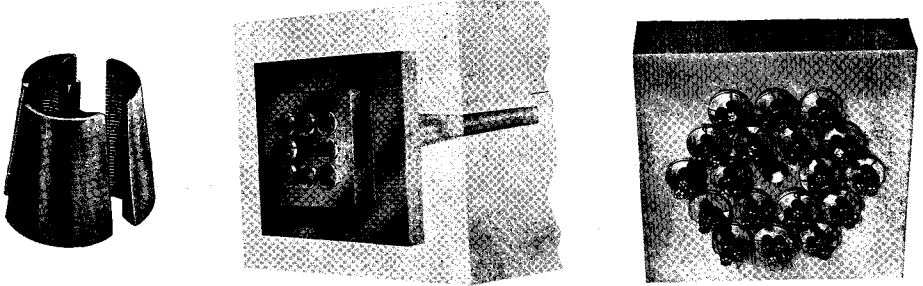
Three-piece wedge anchor (left) seats in wedge plate (right), each wedge holding three post-tensioning strands
